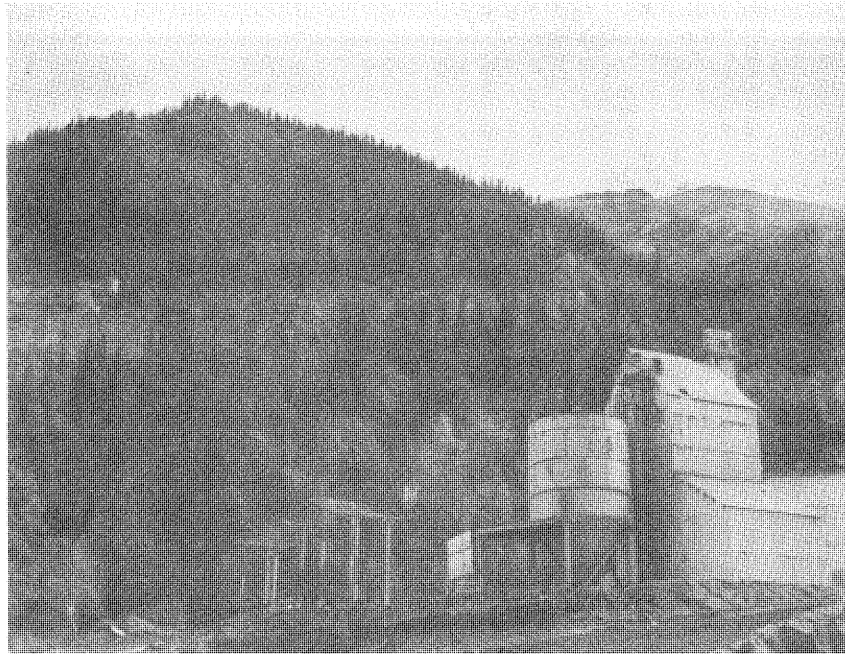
Overall view of tramway installed to transport concrete materials from batch plant to tunnel adit.
